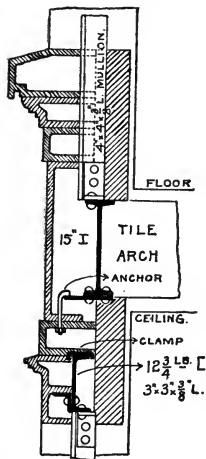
Spandrel Section, Court Walls. Marshall Field Building.
